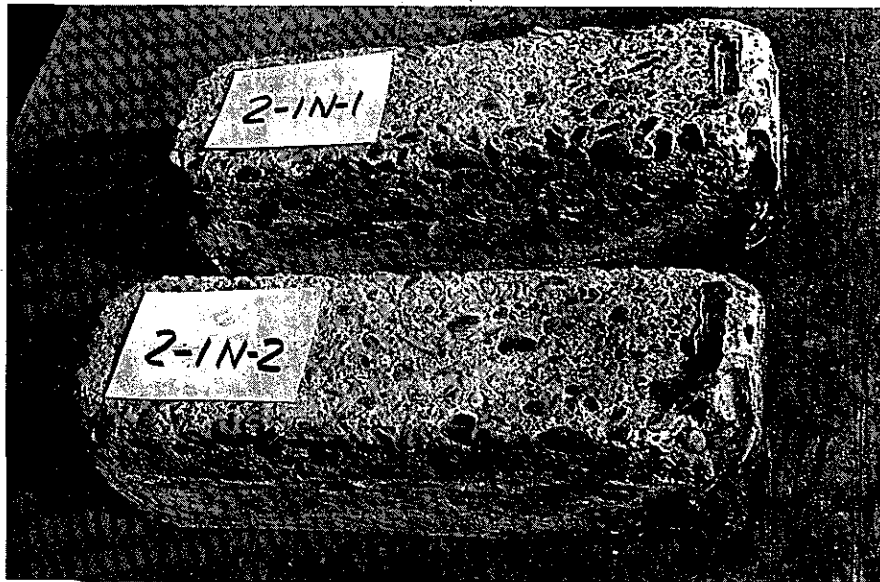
Internally restrained concrete beams made with shrinkage compensated cement no. 2 after 1 yr. sulfate exposure.
